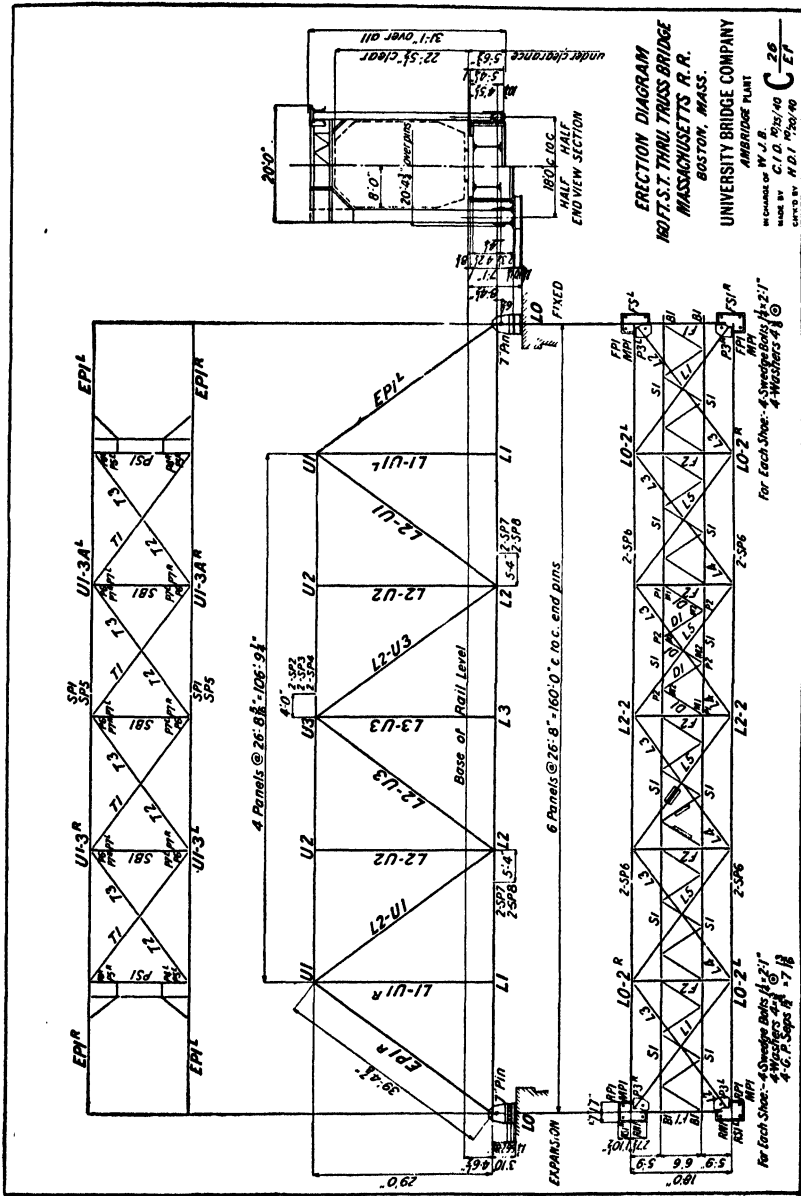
Erection Diagram for a Truss Railroad Bridge.
